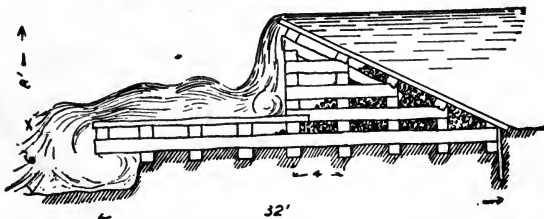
CROSS-SECTION OF APPLETON WEIR.
